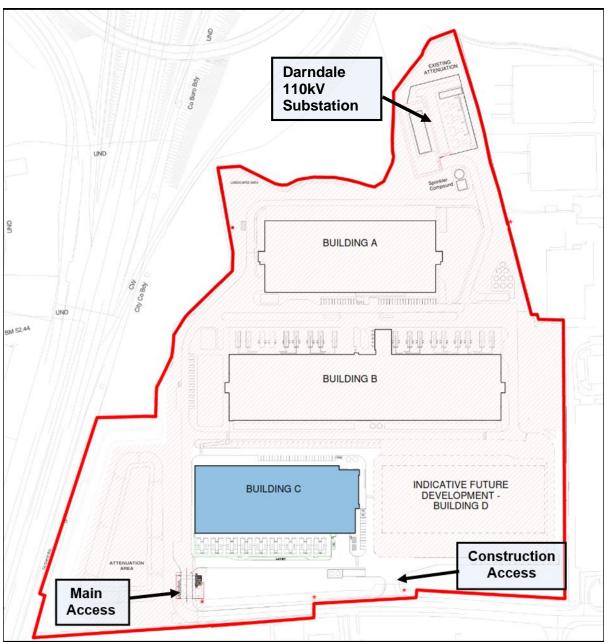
Proposed Site Layout showing Darndale 110kV Substation to the north of the site
